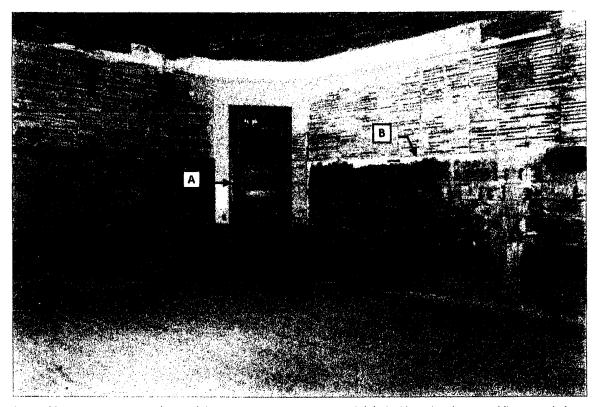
Room 16 view southwest. (A) Door Type 3 – Interior Hinged. (B) Blackboard and case molding are missing.
